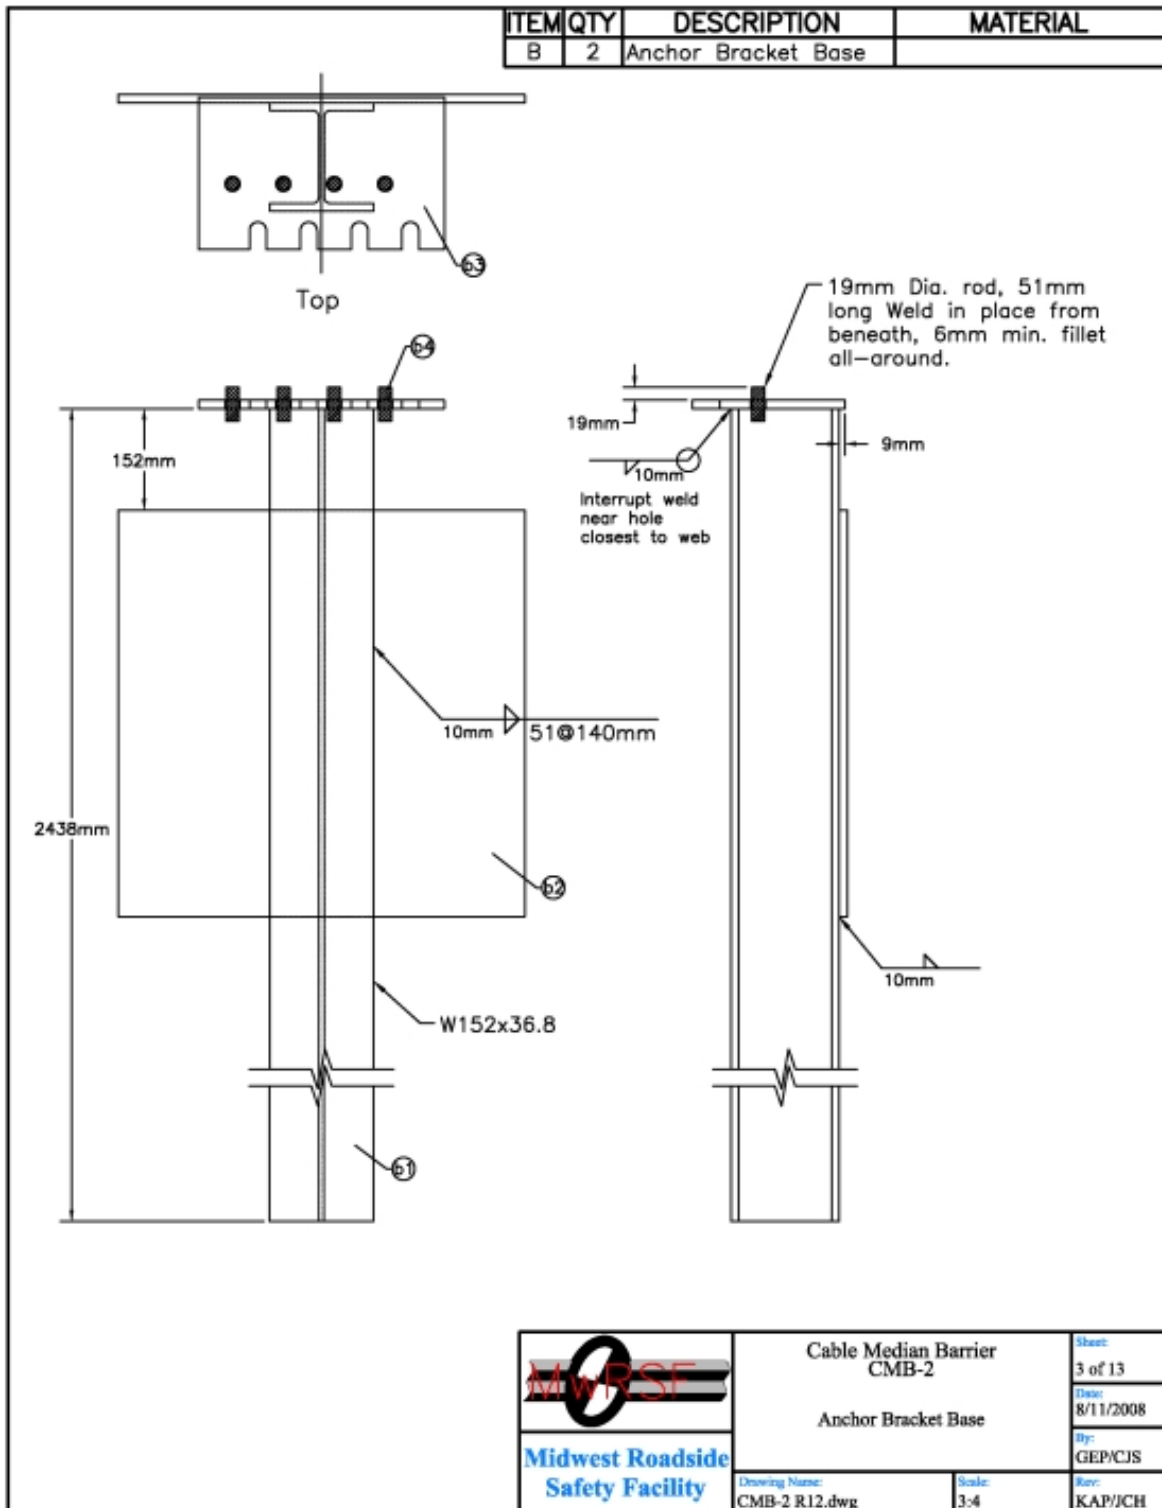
Anchor Bracket Base (Metric), Design No. 2
